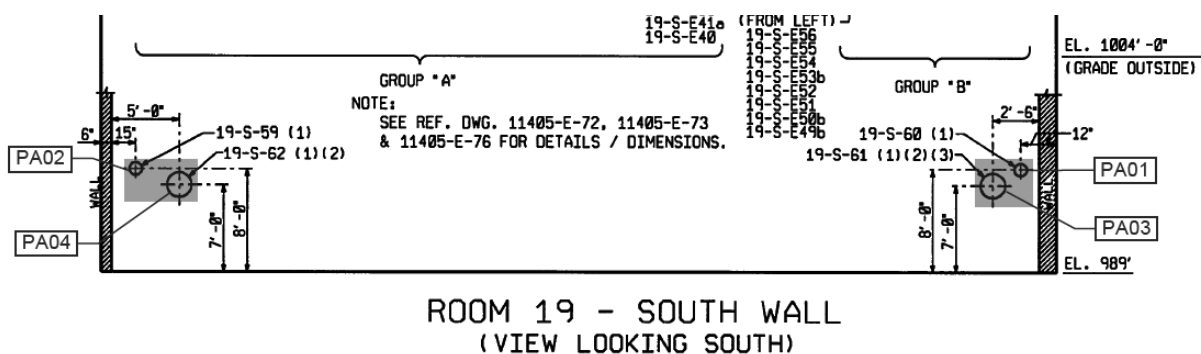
Aux Bldg Room 19 South Wall Penetrations (60139)
